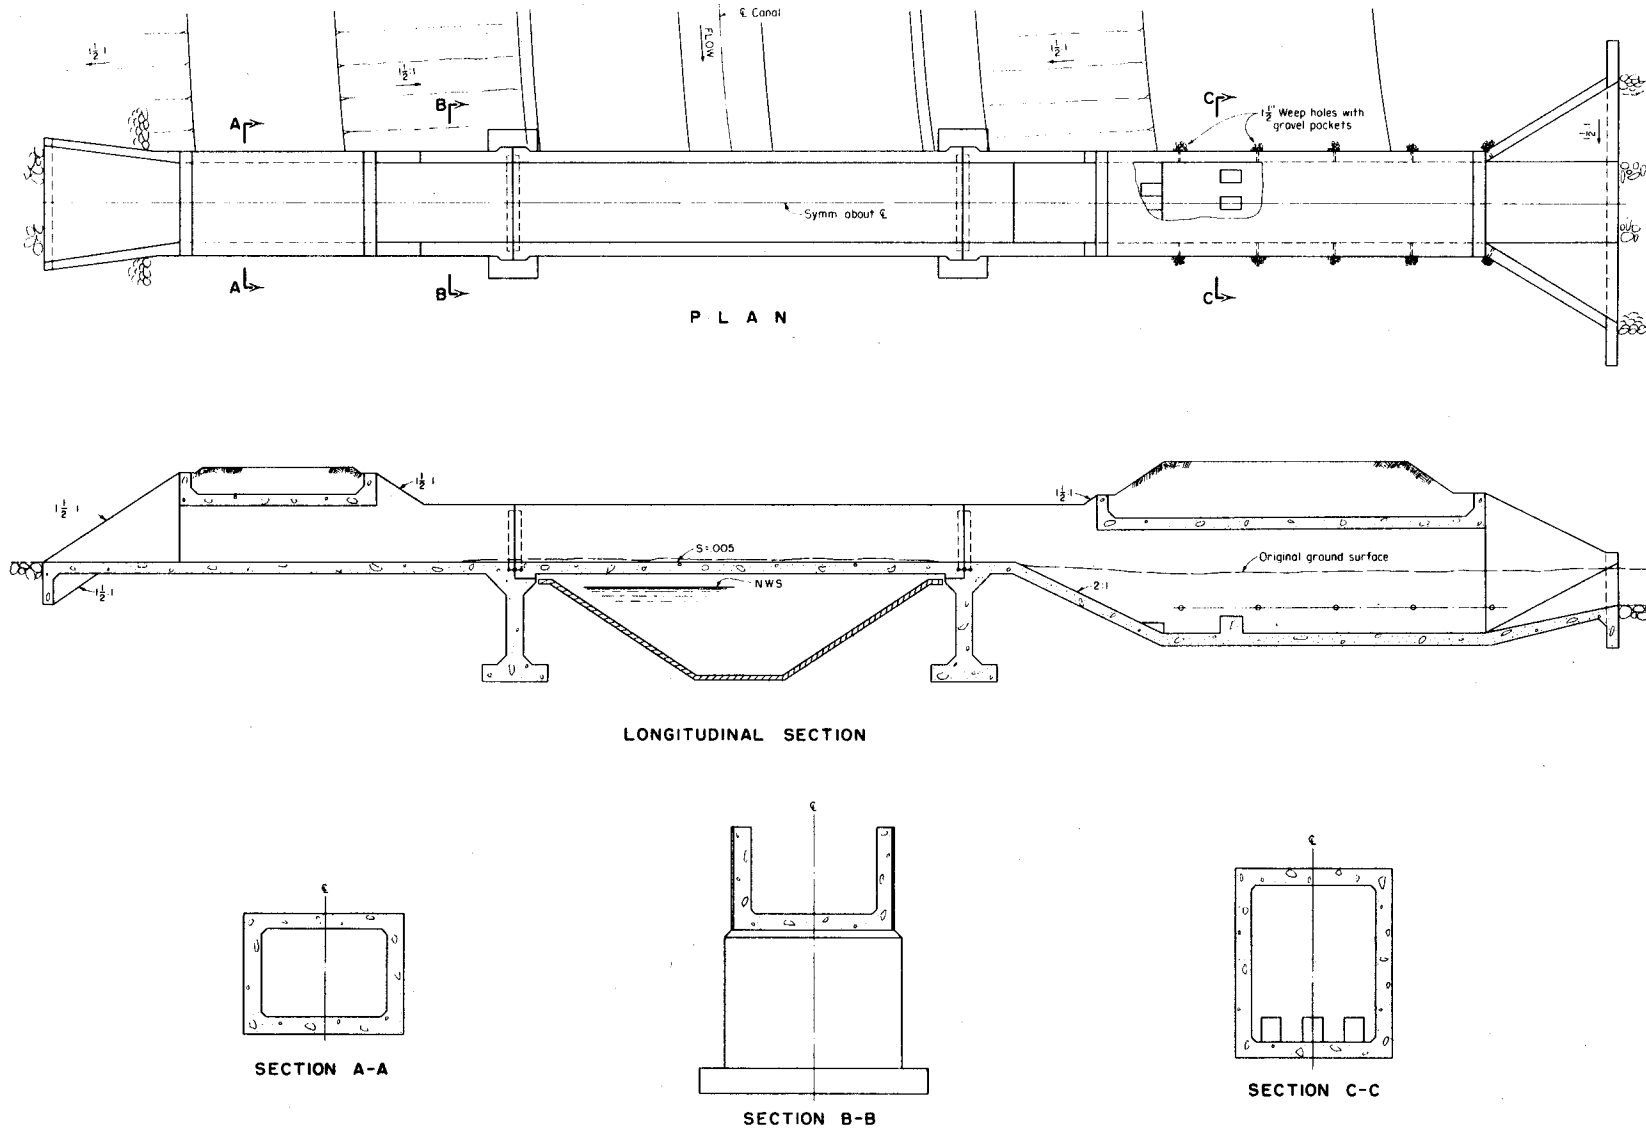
Overchute—typical plan and sections. 103-D-1307
